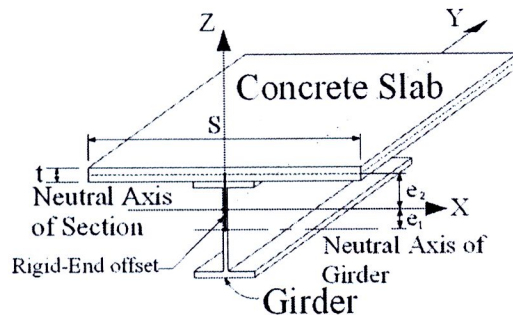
3D physical T-Section of a slab-on-girder bridge
